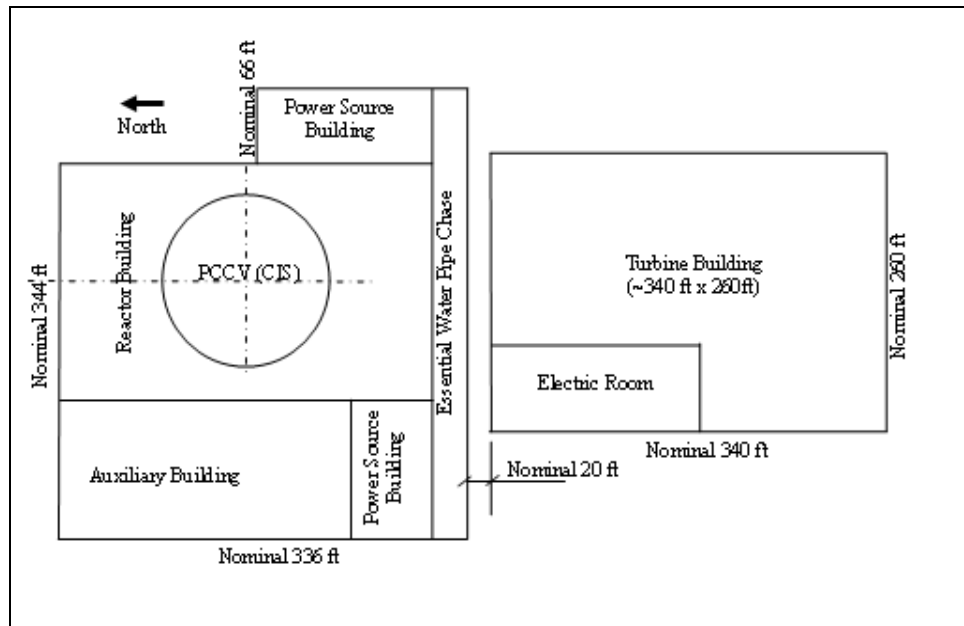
Foundation Layout of the US-APWR Standard Plant Buildings
